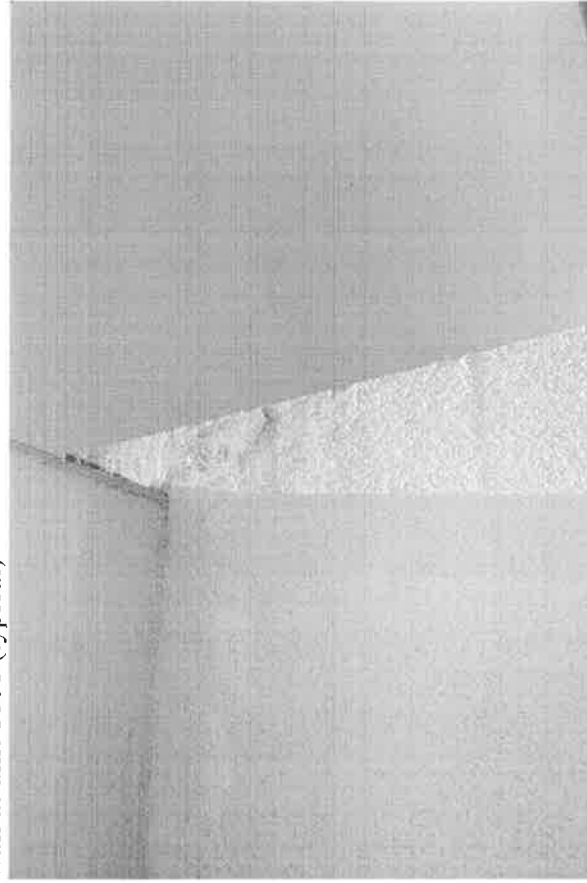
Area of prior repair in CMU wall at unit 401 (typical)
